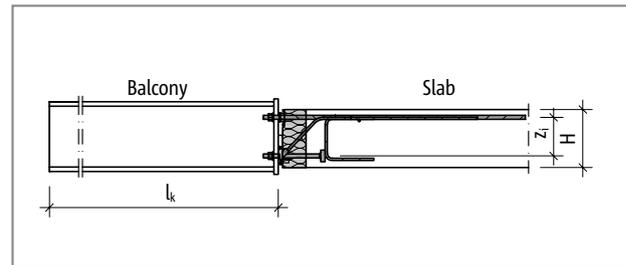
Schöck Isokorb® T type SK: Structural system; Design values refer to the presented cantilever length l_k
